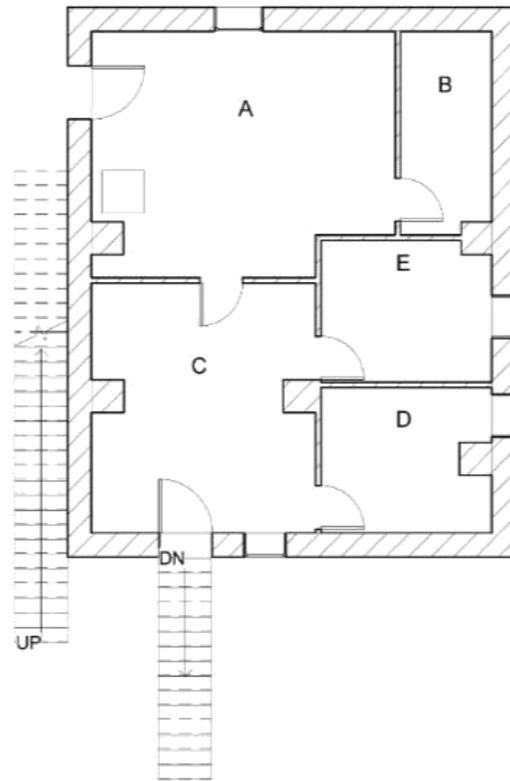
Al-Jadlan House First Floor Preliminary Plan (developed by the researcher)
